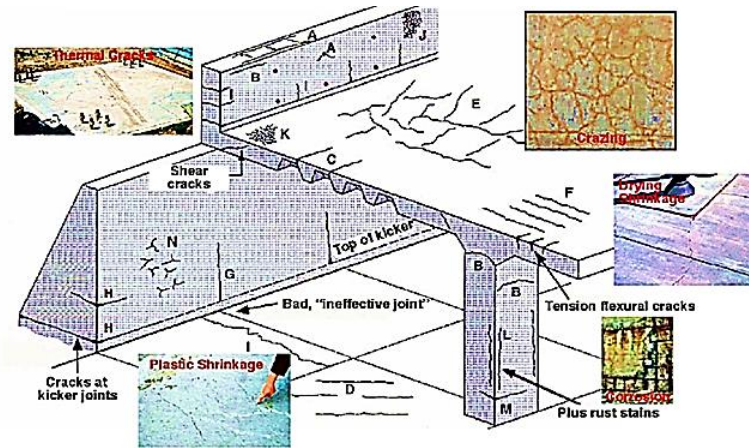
Examples of Intrinsic cracks in hypothetical concrete structure
